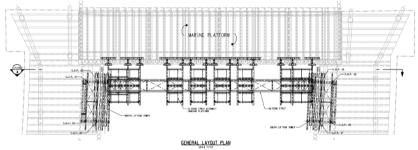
Mega Truss Assembly Yard - Temporary Cradle, Lifting Tower and Strand Jack Layout
